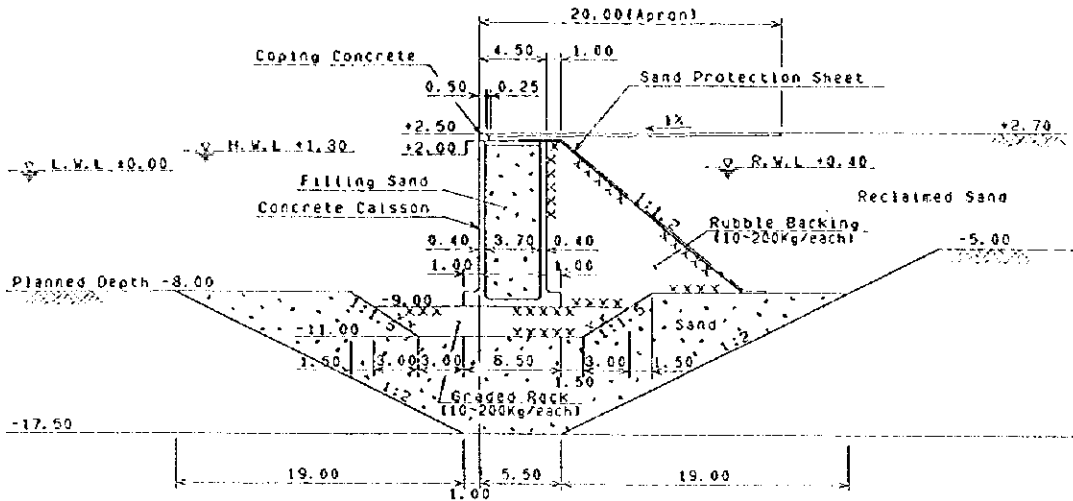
(3) Typical Cross Section of Quaywall E1 (RC Caisson)
